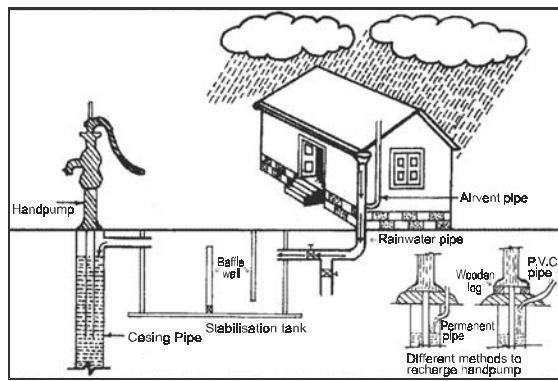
Recharging of hand pump by roof or terraced water.
